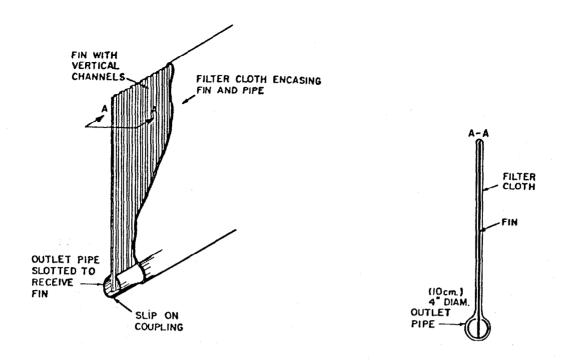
Typical Components of Prefabricated Fin Drains (101)
